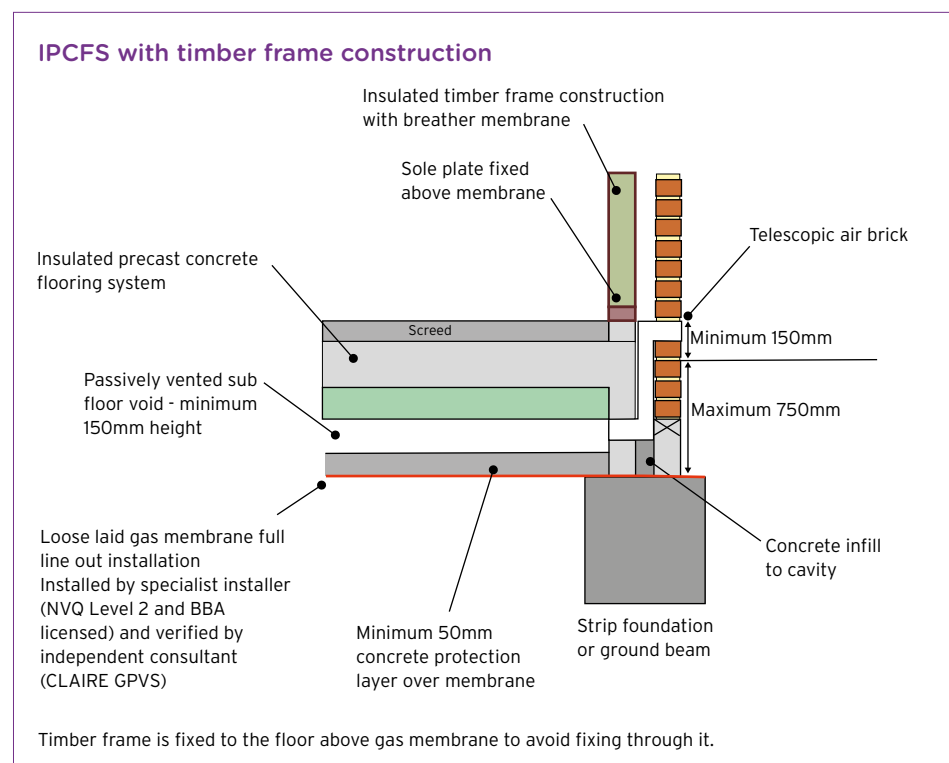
Timber frame and Insulated pre-cast concrete flooring system (IPCFS)
